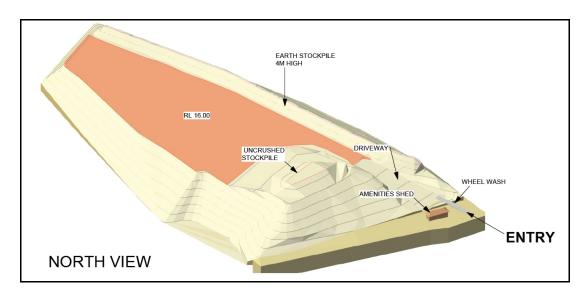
Extract from the 3D model of Stage 2B. Full details are provided on Drawing No.18, Issue E of the plans of the proposed development at Appendix 9.
